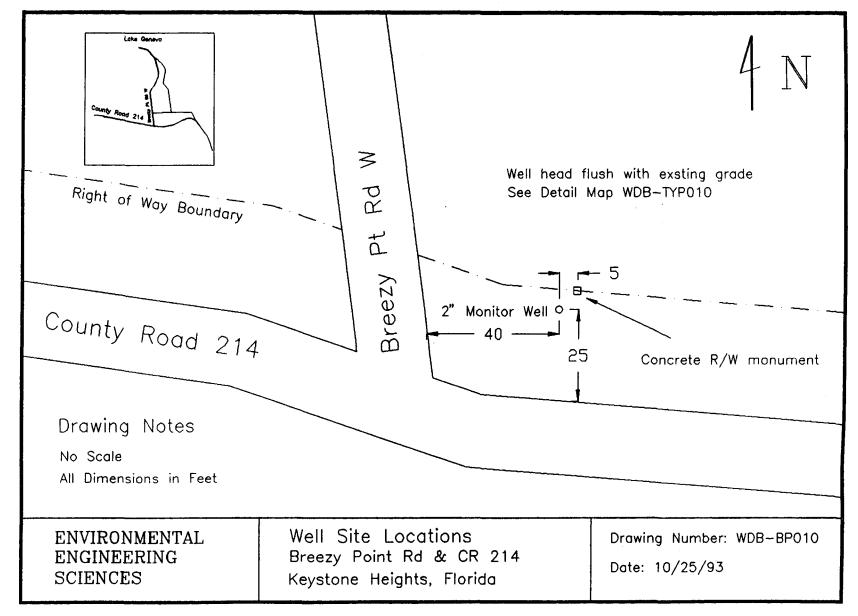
Location of Well 11: CR-214 and Breezy Point Road
